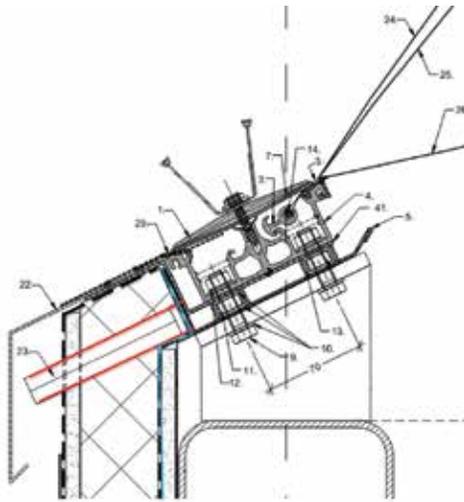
Section through the ETFE system with external drainage (red line) through air barrier (blue line). (Image imported from ETFE manufacturer's shop drawings¹.)
